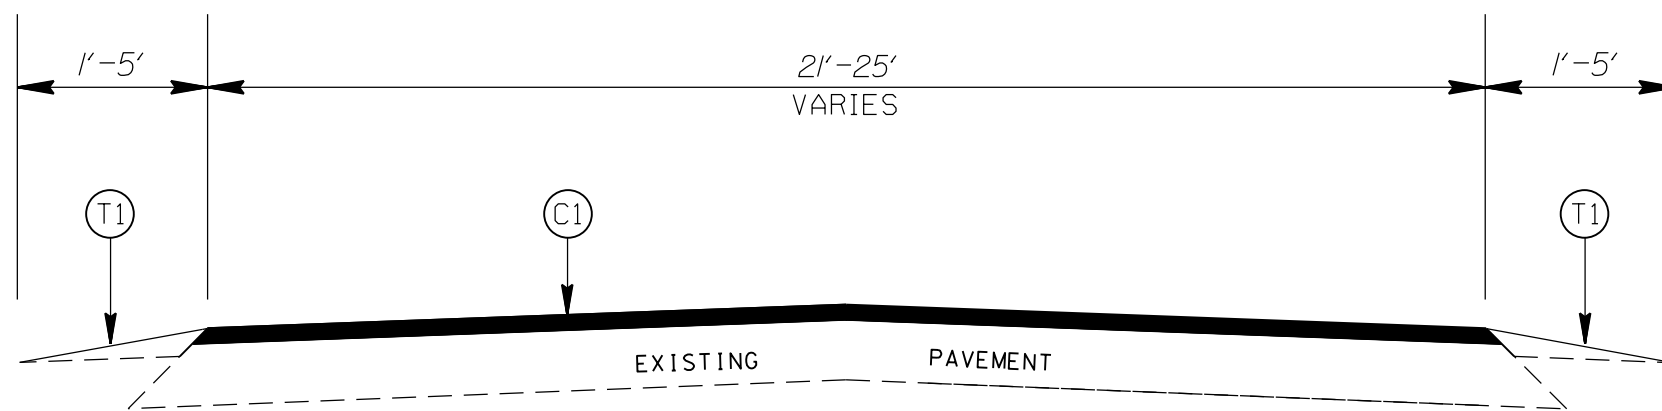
DETAIL FOR PROFILE MILLING (0' TO 1.5')
